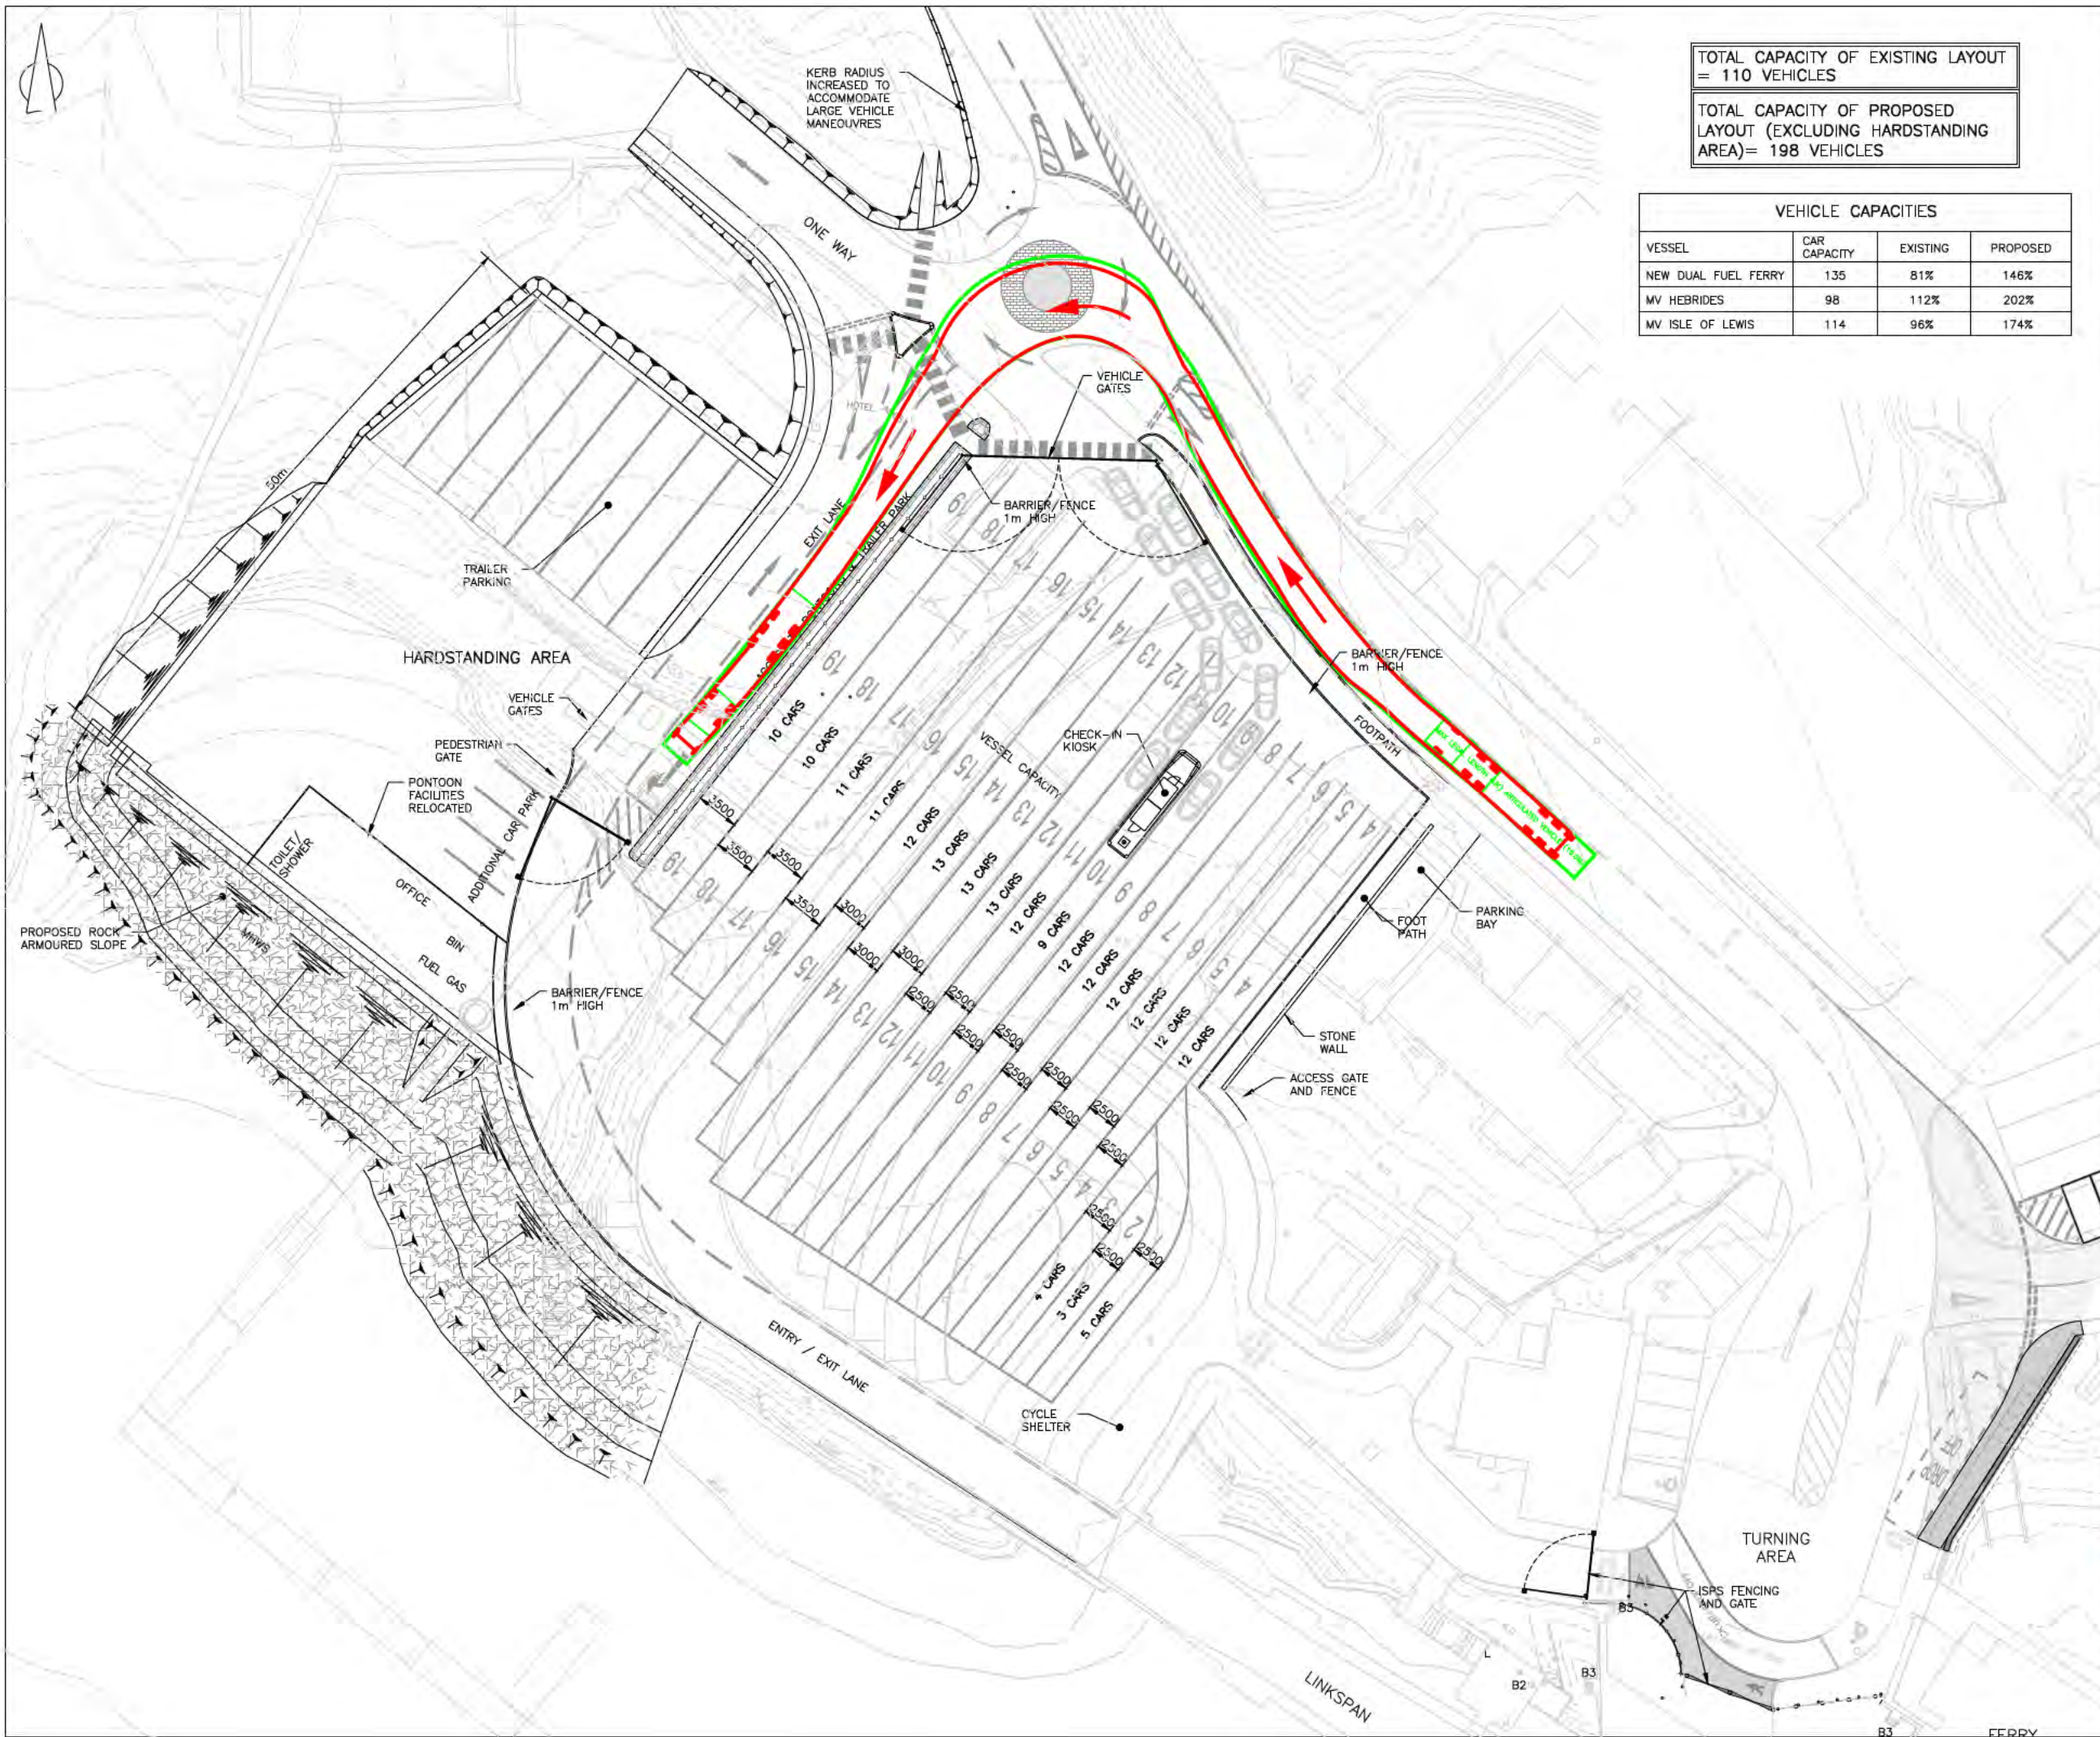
A865 from west towards terminal, reverse into turning area then reverse onto pier and out to A865: no restrictions.
